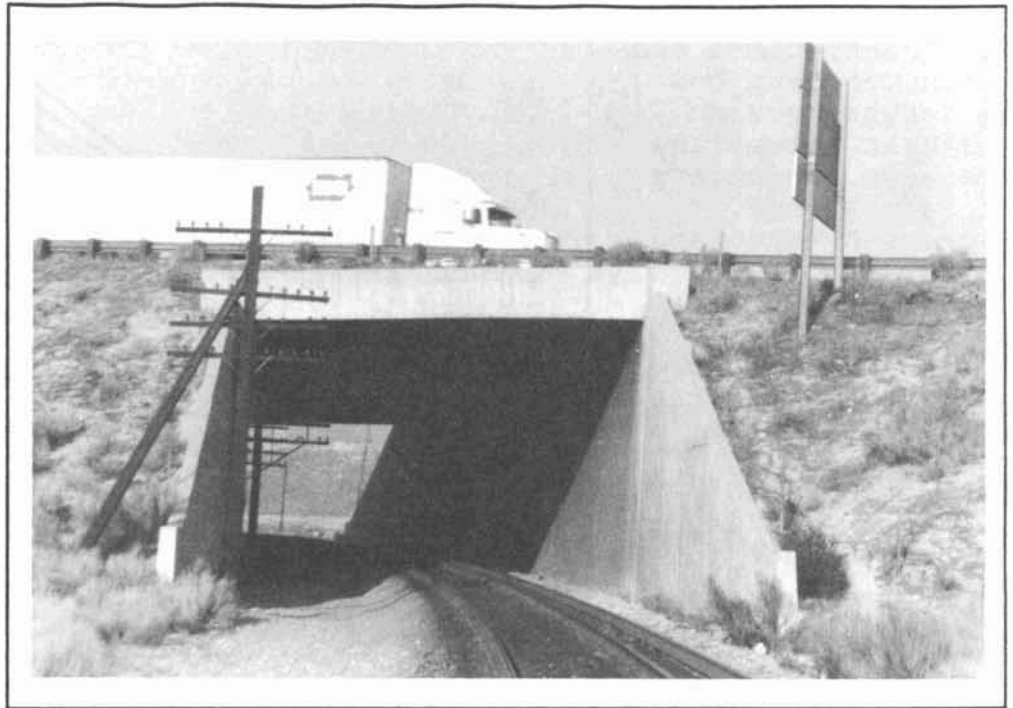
I-15 Box Bridge Over the Railroad
